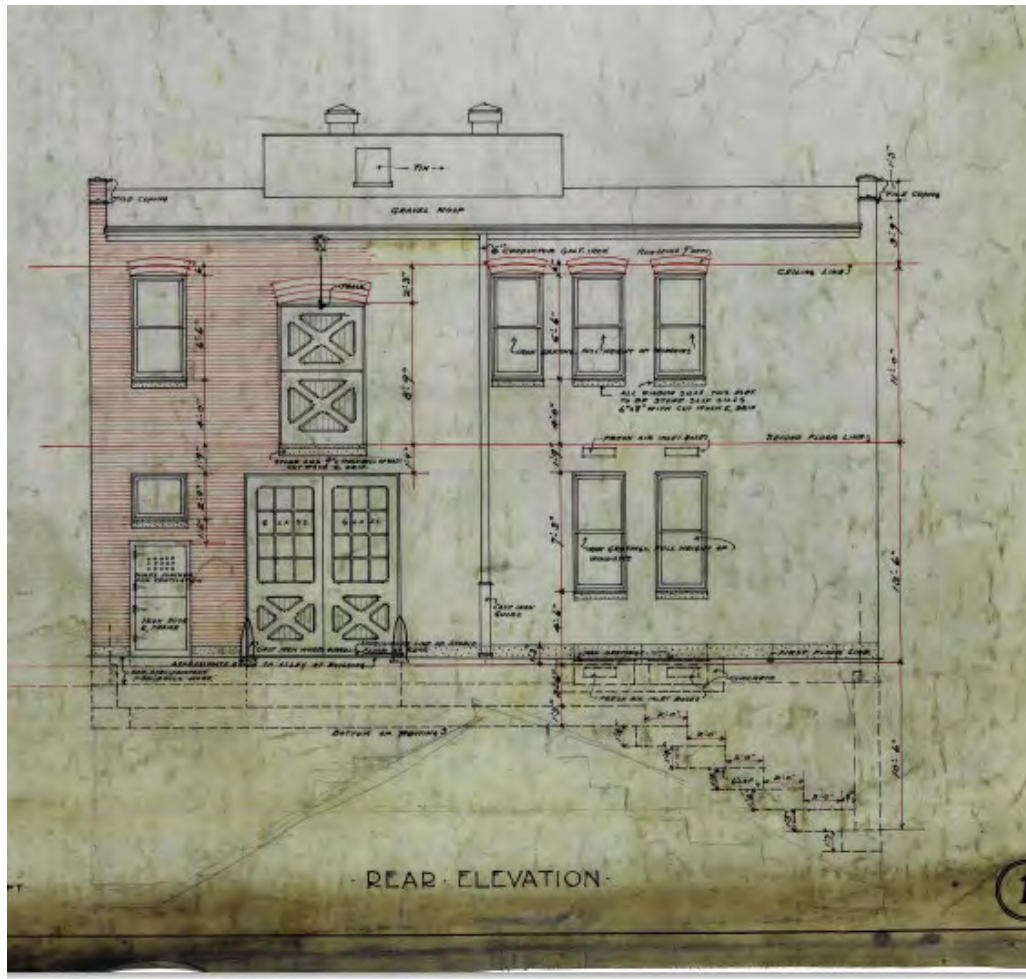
Stotz's rear elevation. Note the original three windows on the second floor, still retained, although the stable and hay loft doors are no longer extant. (Courtesy Stotz Archives, MCF Architecture).
